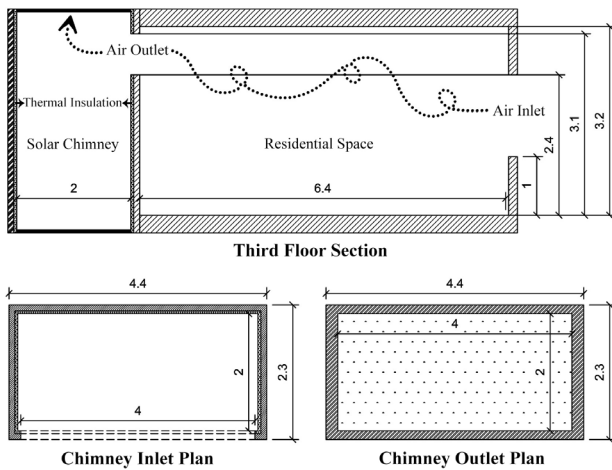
Detail drawings of the solar chimney configuration. Source: Authors.
